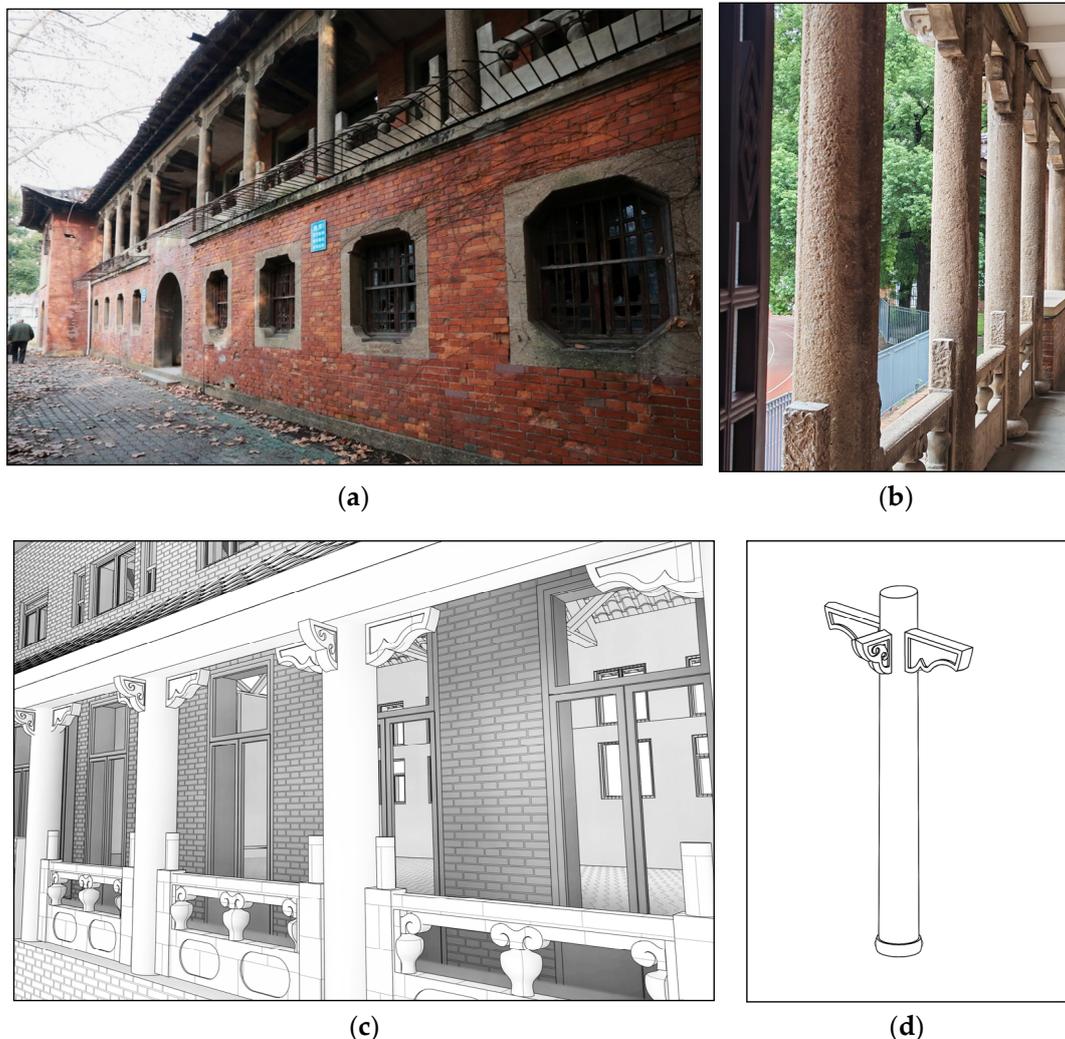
Component virtual repair (source: author). (a) Second-floor corridor of building. (b) Detailed pathologies of column members. (c) Virtually restored colonnade. (d) Virtually restored column family.
